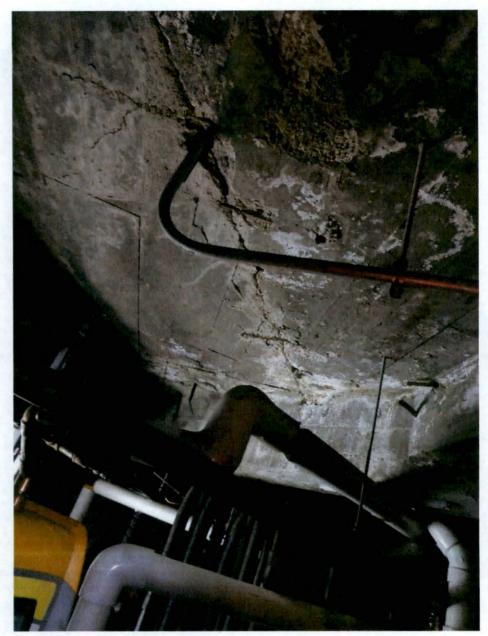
Large crack and visible rebar at underside of concrete roof deck – Tenth Floor.
